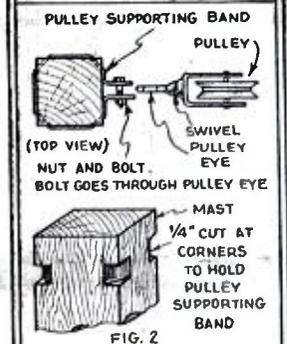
Enlarged view of the section shown at Fig. 1, showing corners of mast cut to hold pulley wire or rope. Commercial type hooks are available in the chain stores very cheaply; see figures below. Iron parts are best painted to give weather protection. A piece of galvanized iron wire may be used to hold the pulley instead of a ground clamp.
